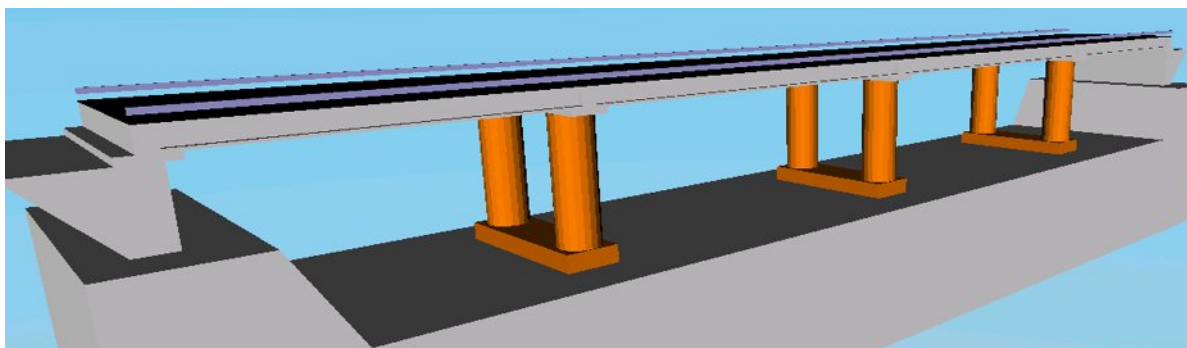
Prefabricated bridge modelled in VISIPLAN environment
